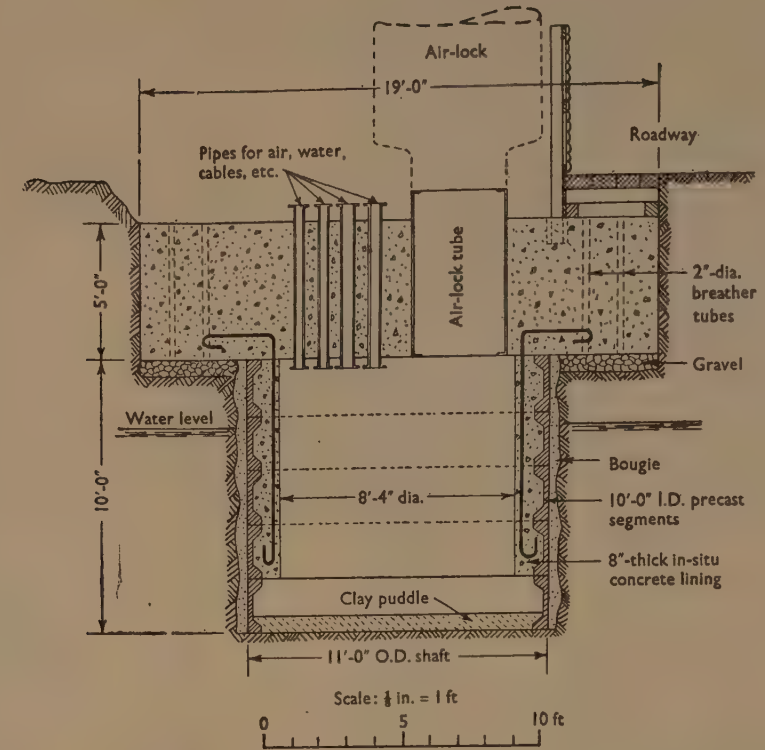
AIR DECK AT WORKING SHAFT ON FIRST SECTION
